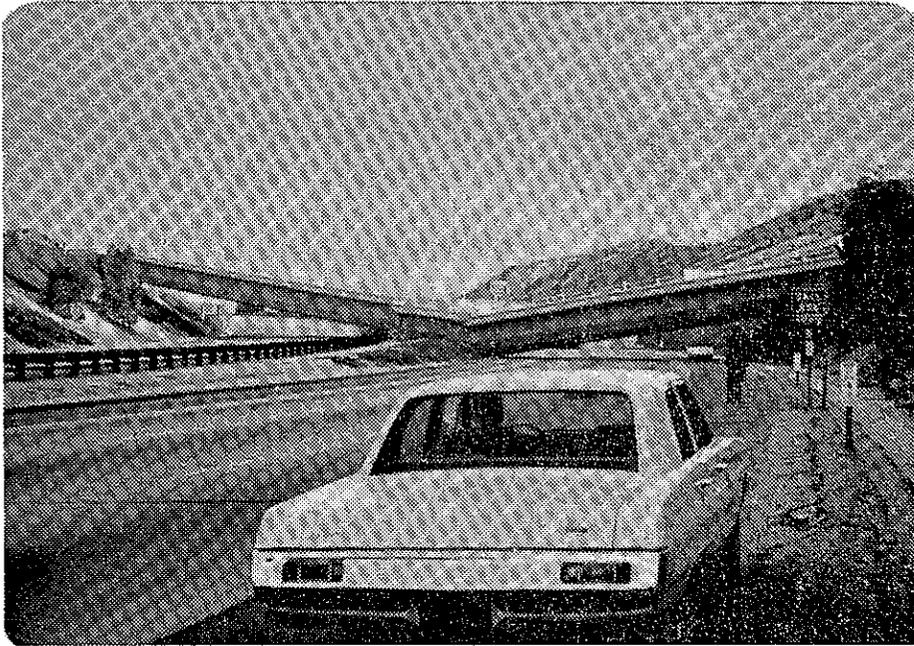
Looking northerly at the collapsed Route 5 southbound truck freeway bridge over Route 405.
